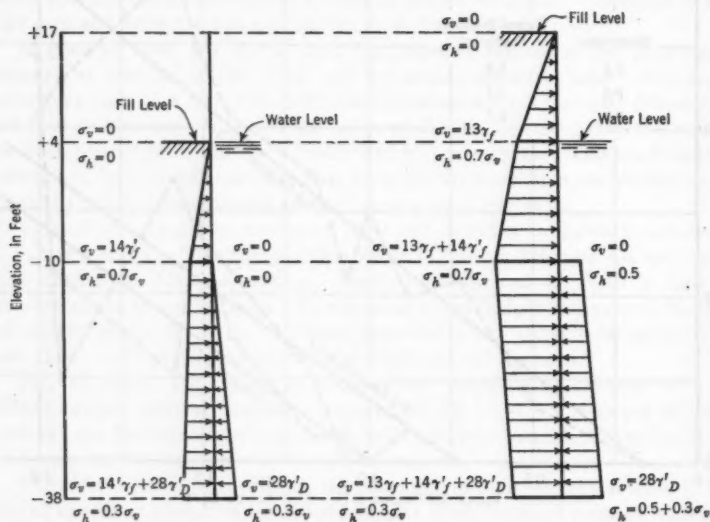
SOIL PRESSURES USED FOR COMPUTATION OF BULKHEAD DEFLECTION AND ANCHOR PULL
